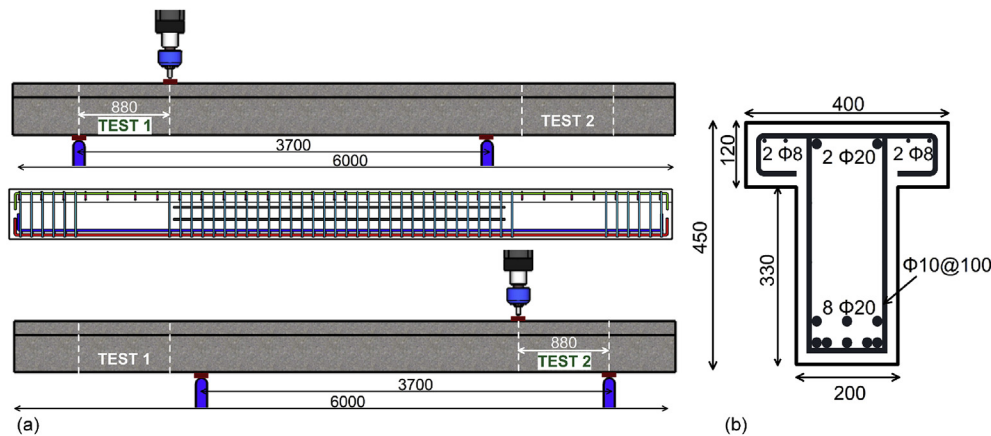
Full-scale T-beams: (a) Beam geometry and reinforcement; (b) cross section (dimensions in mm).
